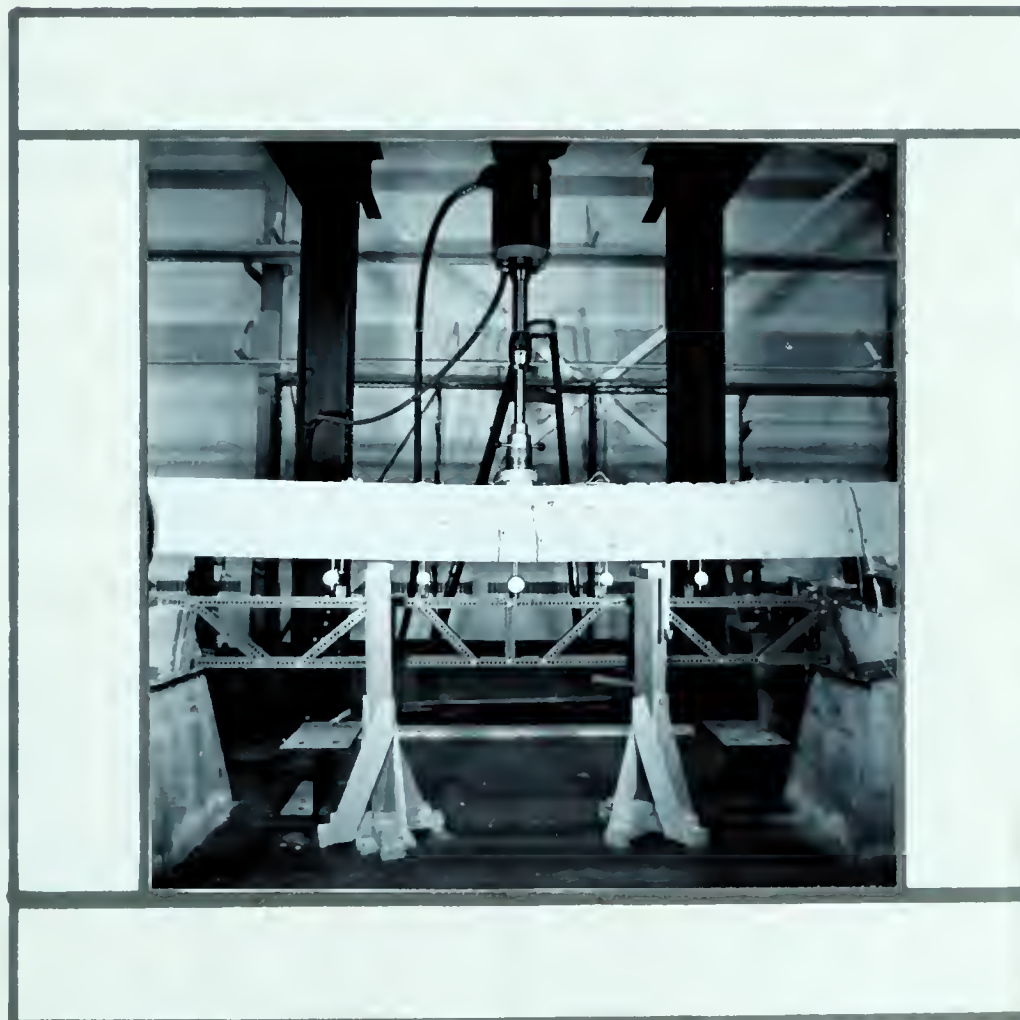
TYPICAL CRACKING PATTERN FOR A "LONG" ONE-POINT LOADED BEAM
